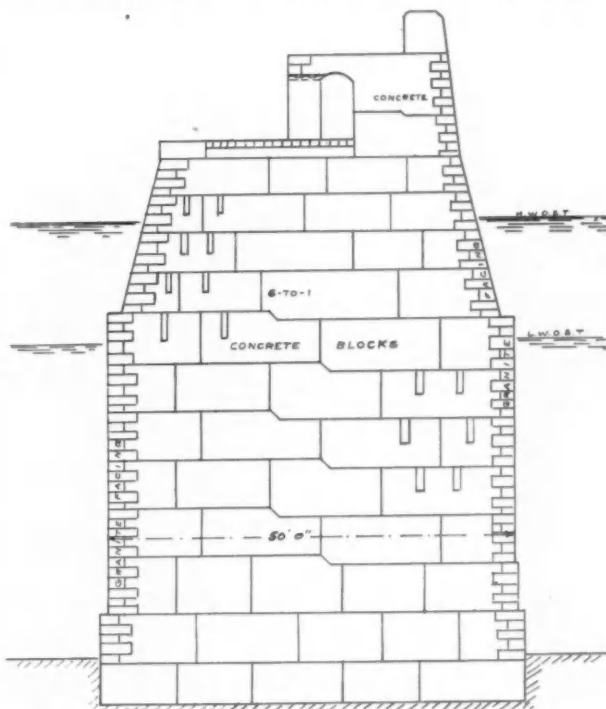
North Tyne Pier. Typical Concrete Breakwater.
